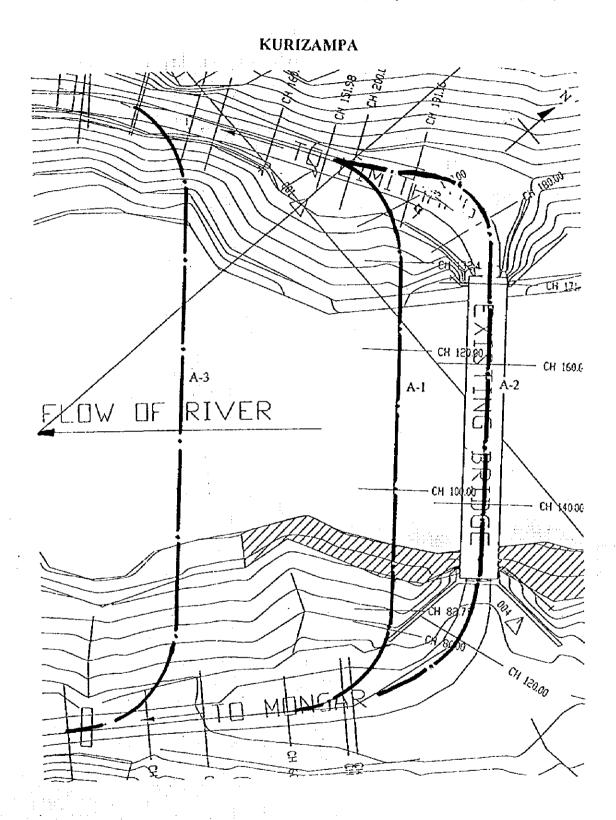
Plan of Alignment Alternatives for Bridge No. 1 Kurizampa (Not to scale)
